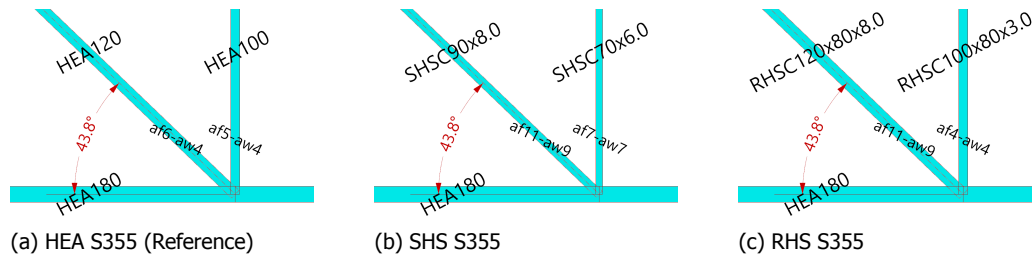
Flange-weld size (af) and Web-weld size (aw) per cross-section family of posts and diagonals
